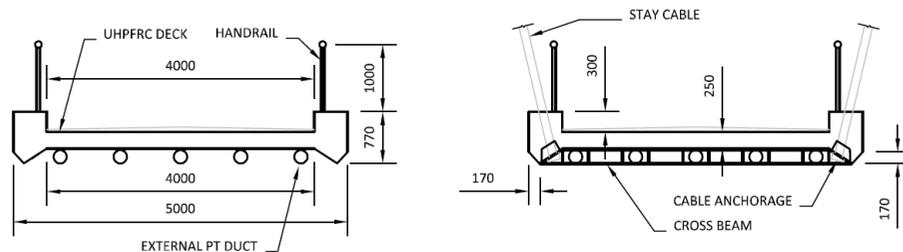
Cross section view of bridge. a) Typical section, b) At cable anchorage.
